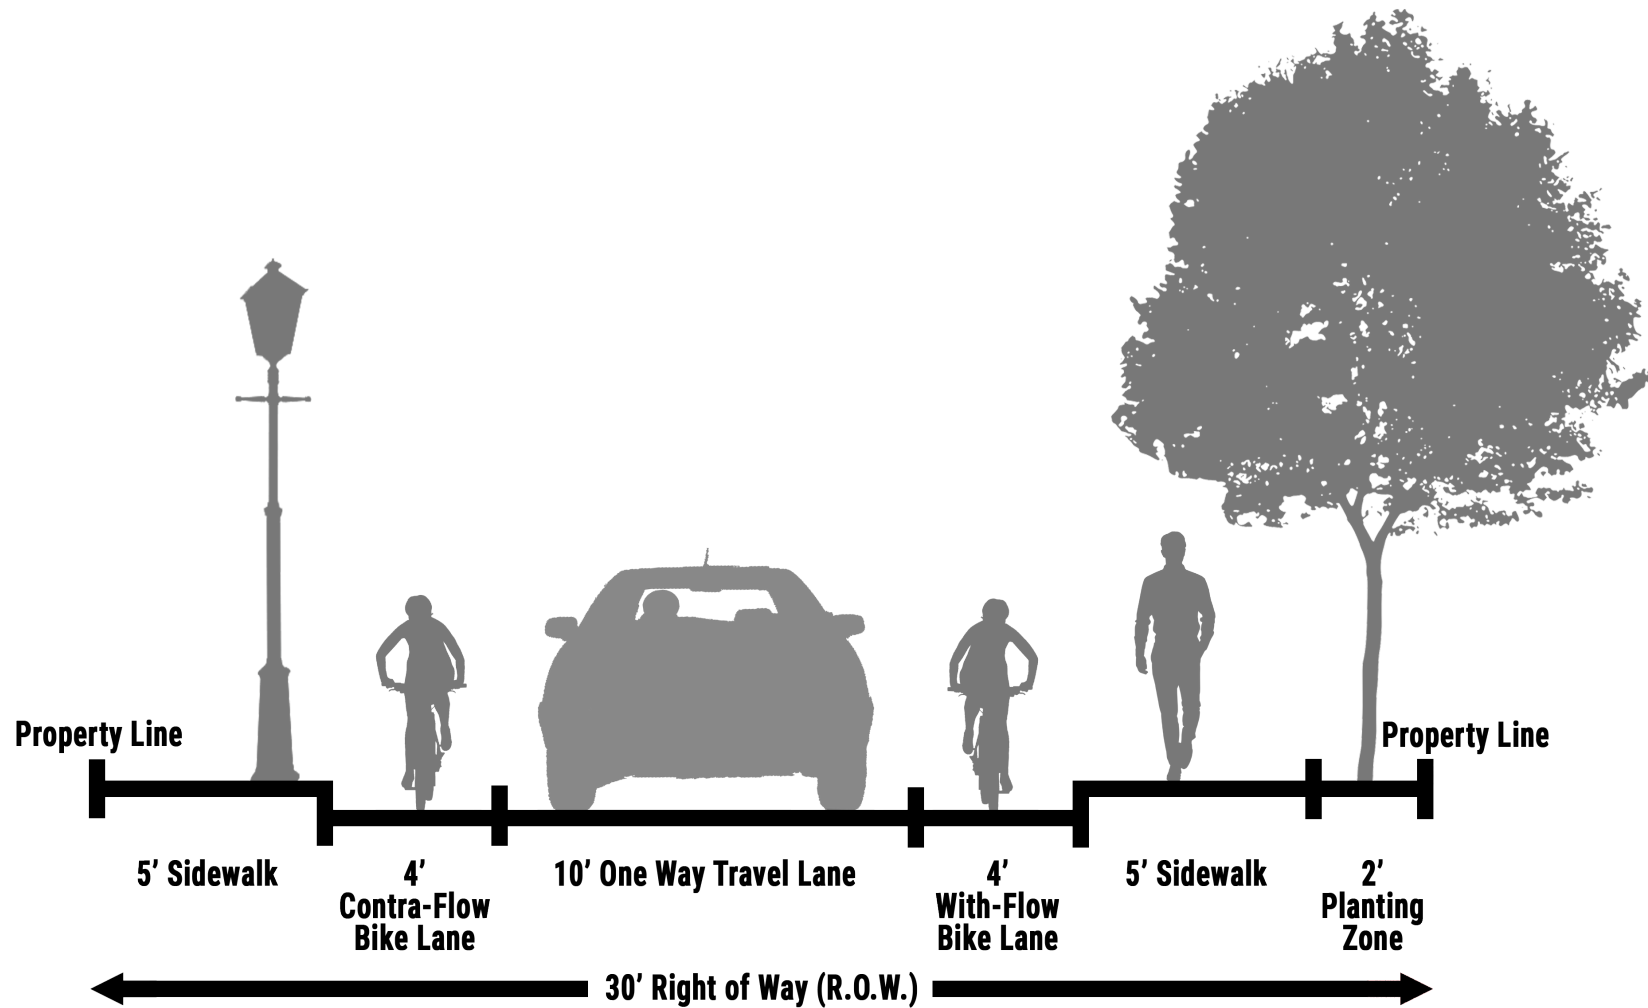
Cross-Section Drawing of Recommended Dedicated Space in Myers Street
